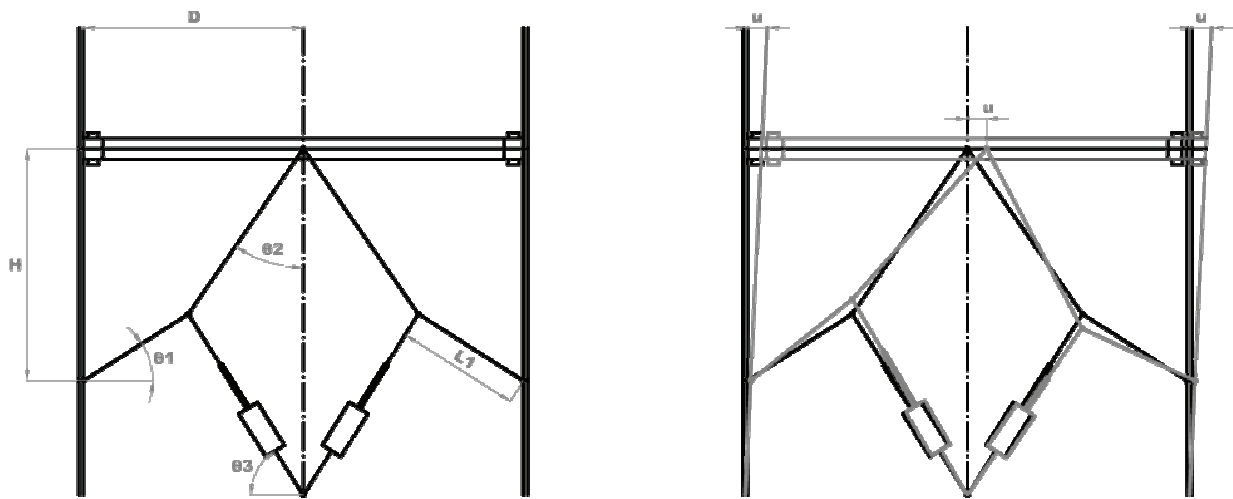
Lower-toggle bracing geometry alignment (left) and deformed (right) [2]
